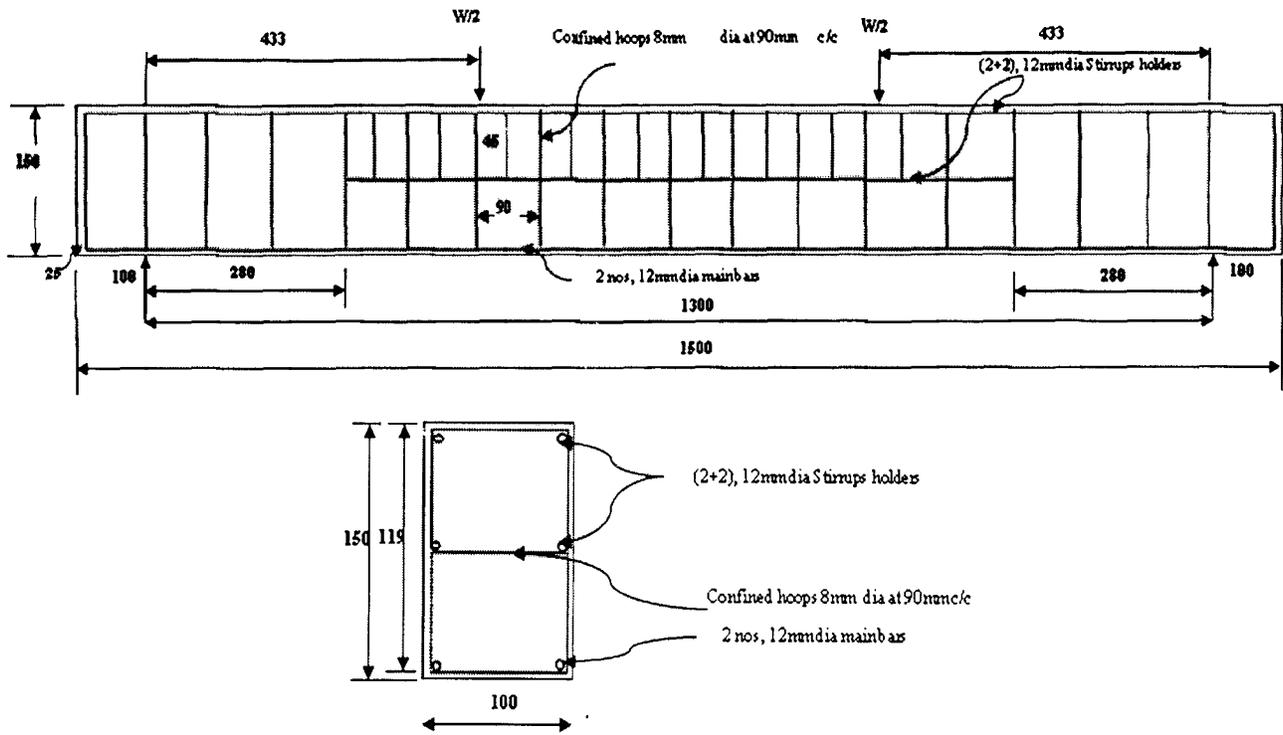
Sectional details of non confinement of RC beam (profile-1, spacing, $s = 0.75d$).
